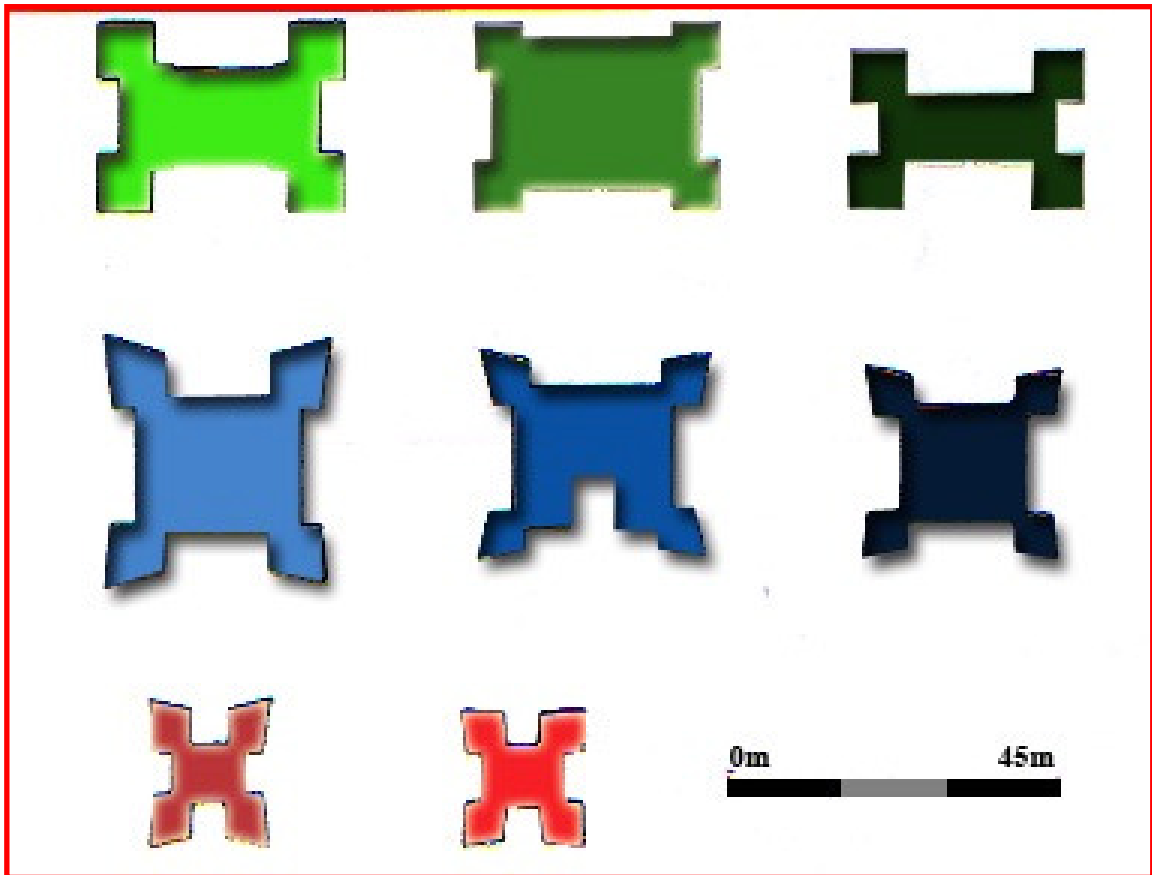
A comparative outline plan of fortified houses (adapted from Kerrigan 1995).
